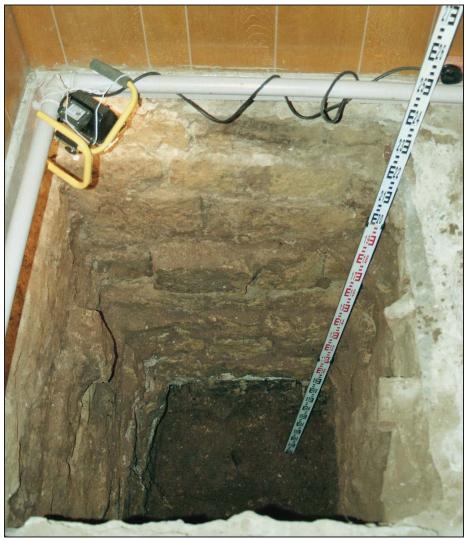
(1/36): Test pit 1 (TP1), excavated view 2.3 m below floor level, from the east south-east
